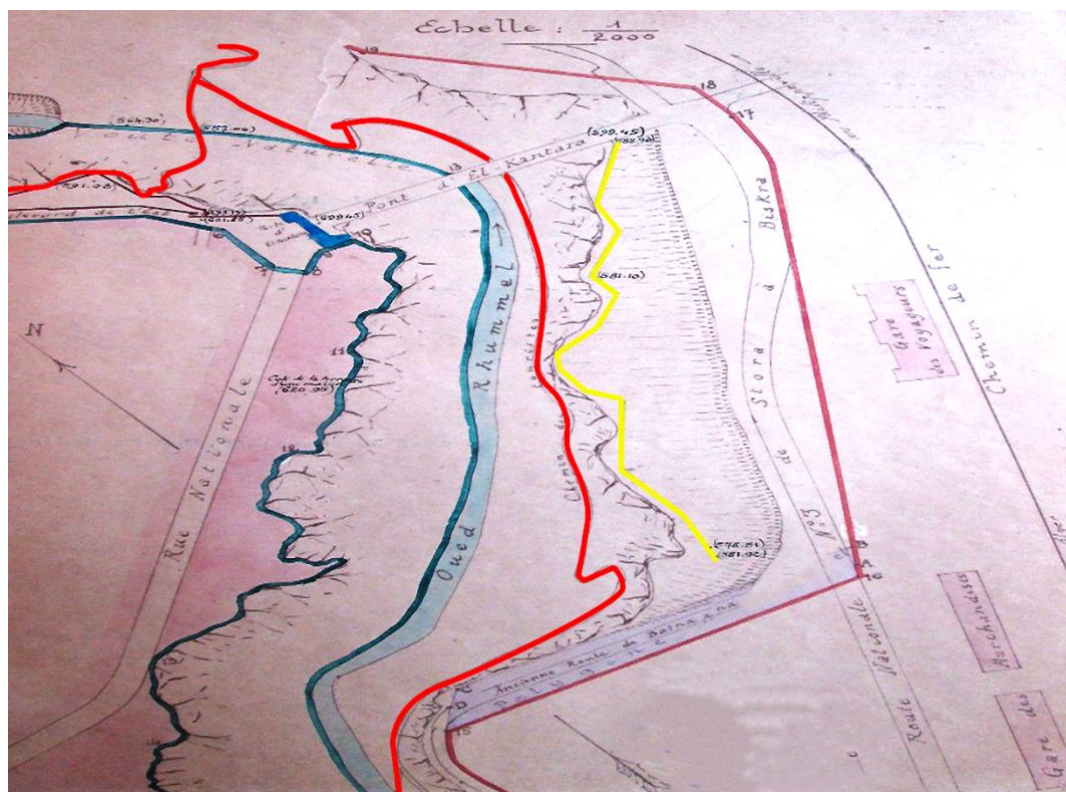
Plan of the Tourist Trail Construction Project, 1917.
